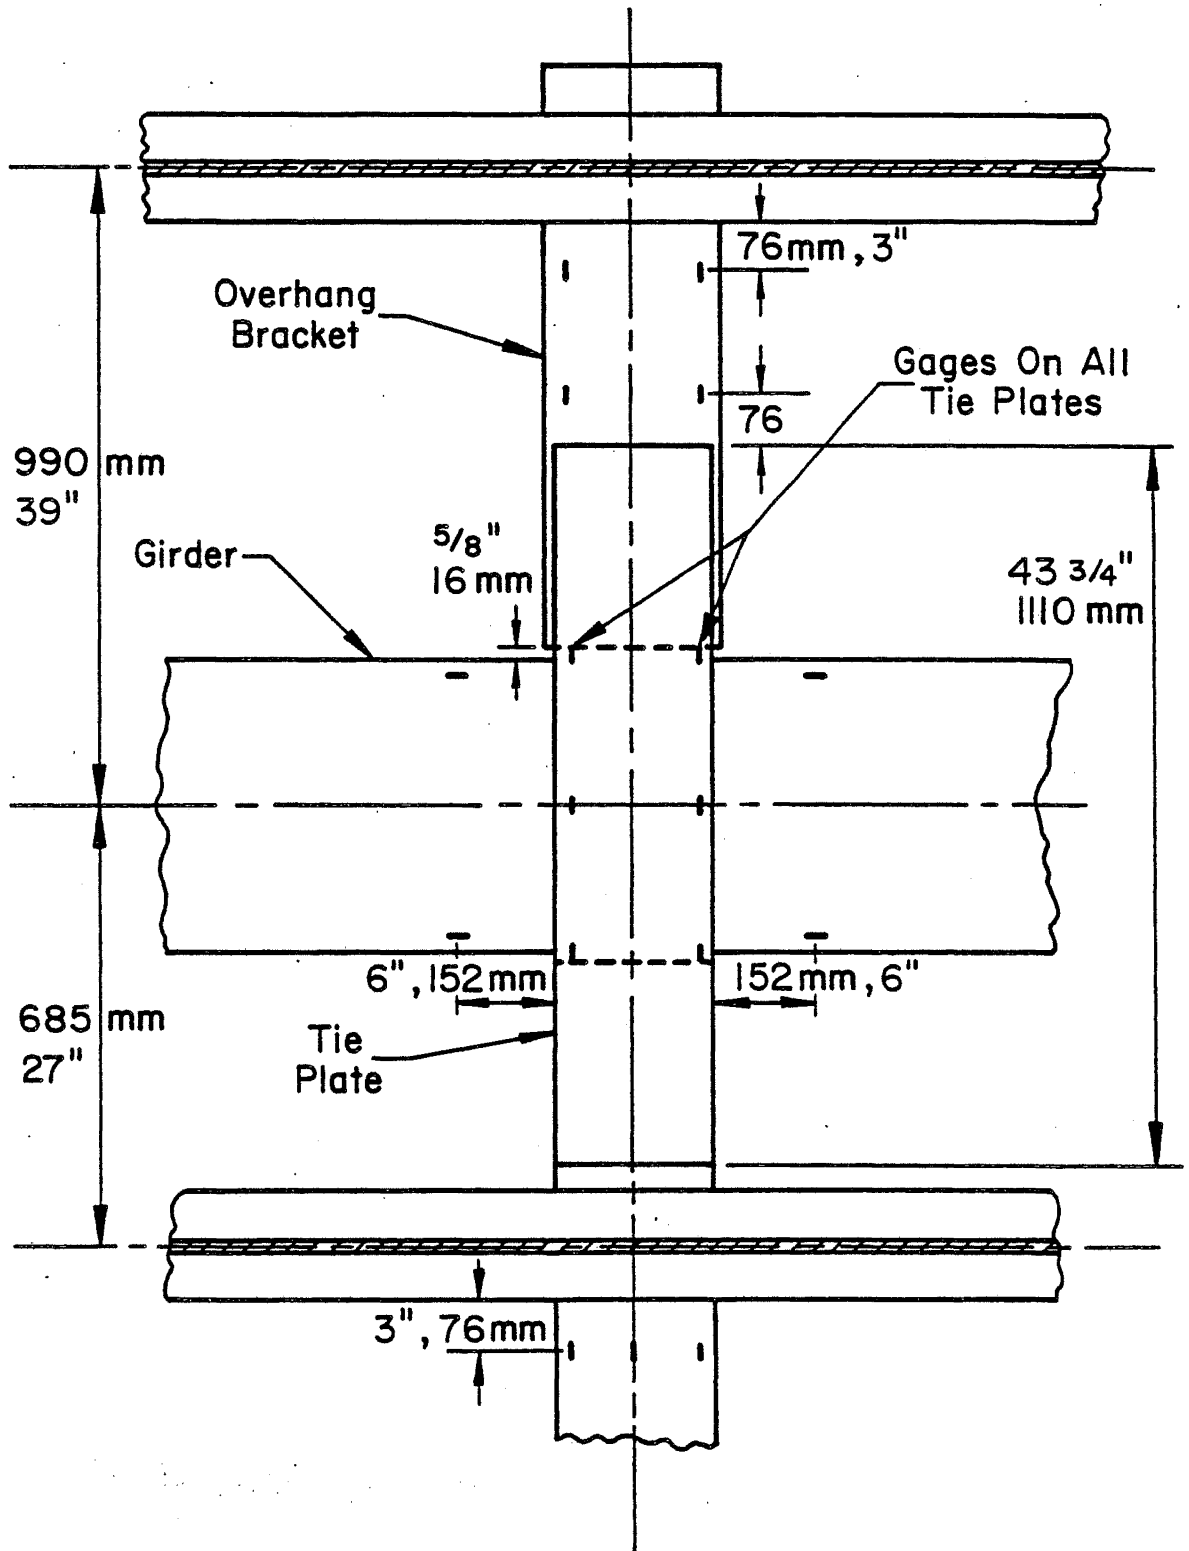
Arrangement of Gages at Tie Plate of Floor Beam 2
